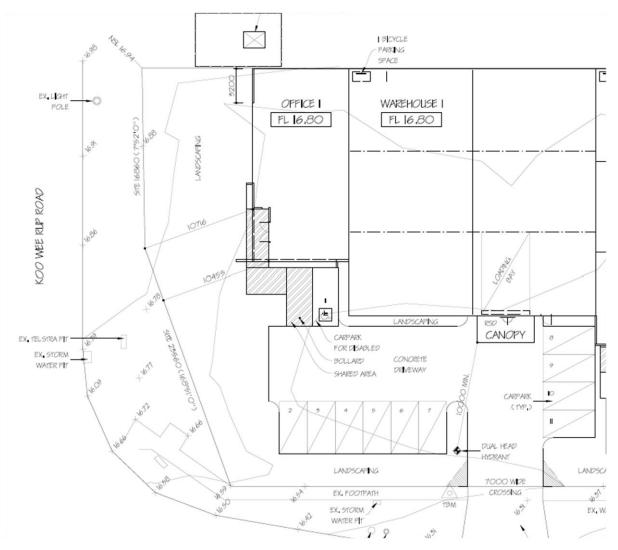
SITE DEVELOPMENT PLAN (SOURCE: STEPHEN D' ANDREA PTY LTD)
